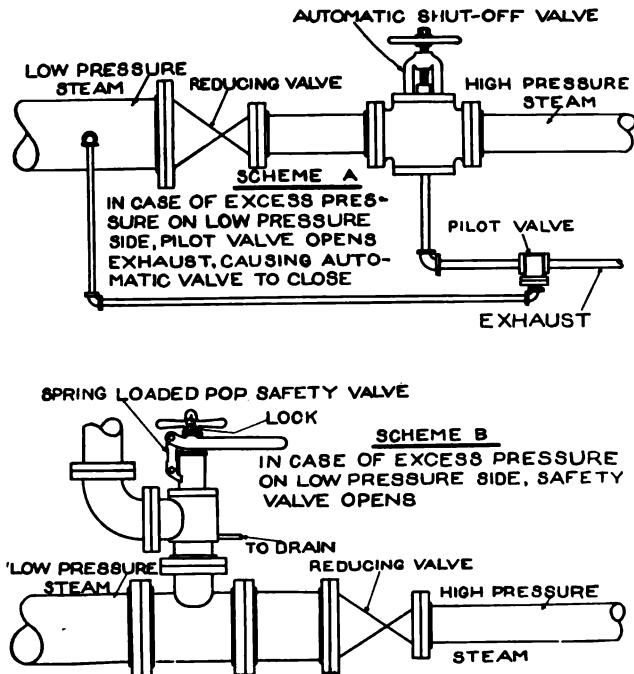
Reducing Valve Installations for Equipment using Low-Pressure Steam.
